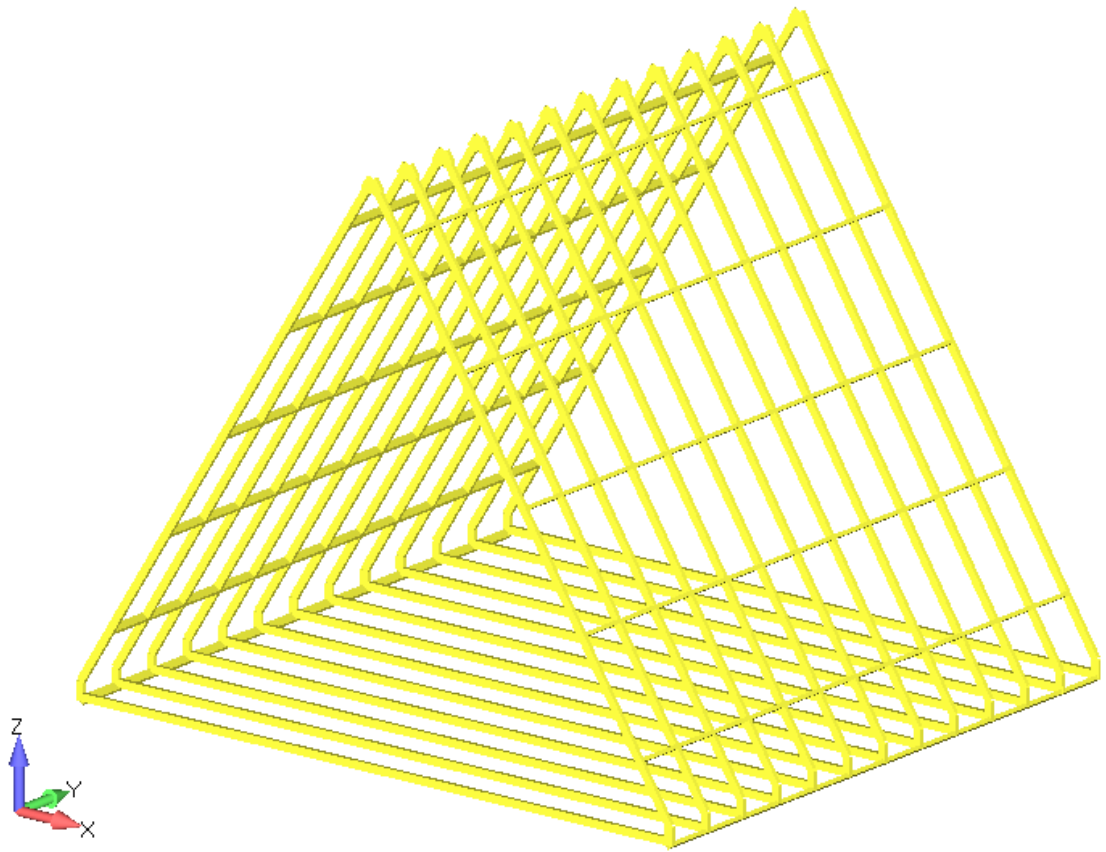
General view of the FINHA-A 150 building frame, 10 meters wide
